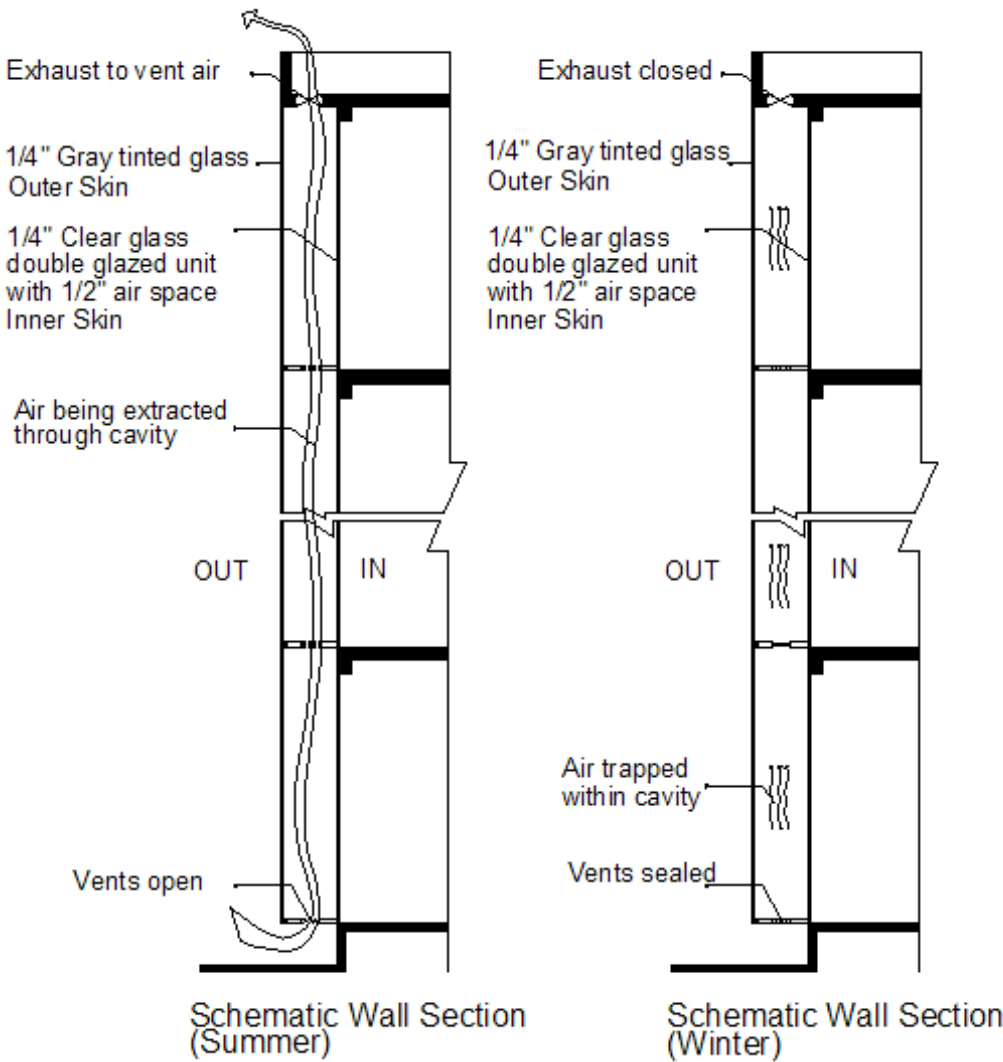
Schematic Wall Sections for Strategy Two for Summer and Winter
